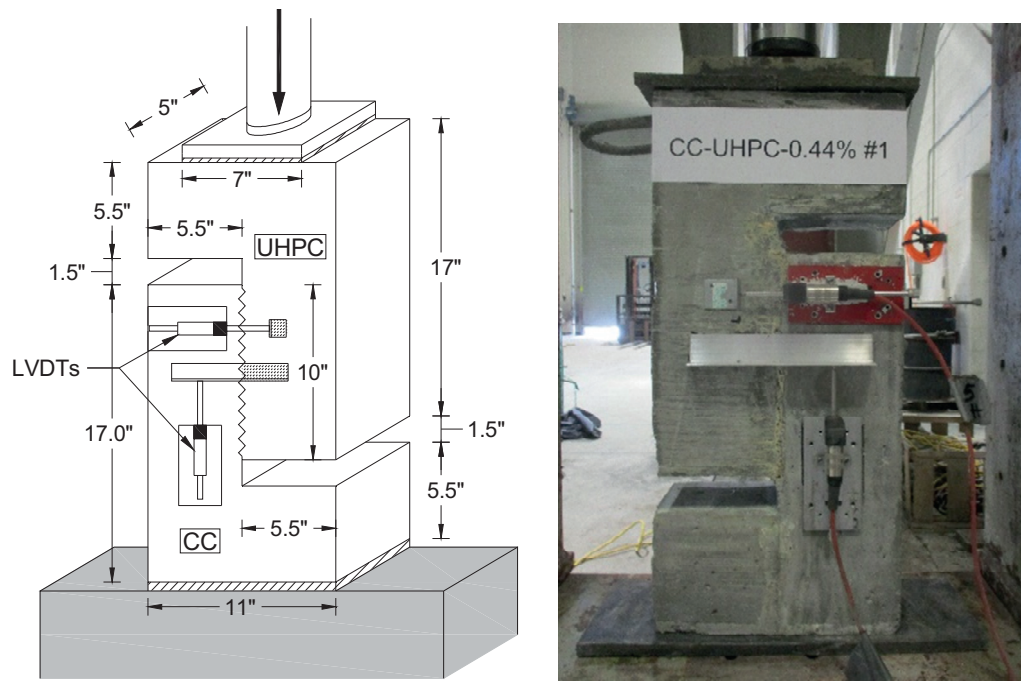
L-Shape Push-off Test Setup and Reinforcement Details (in.).
